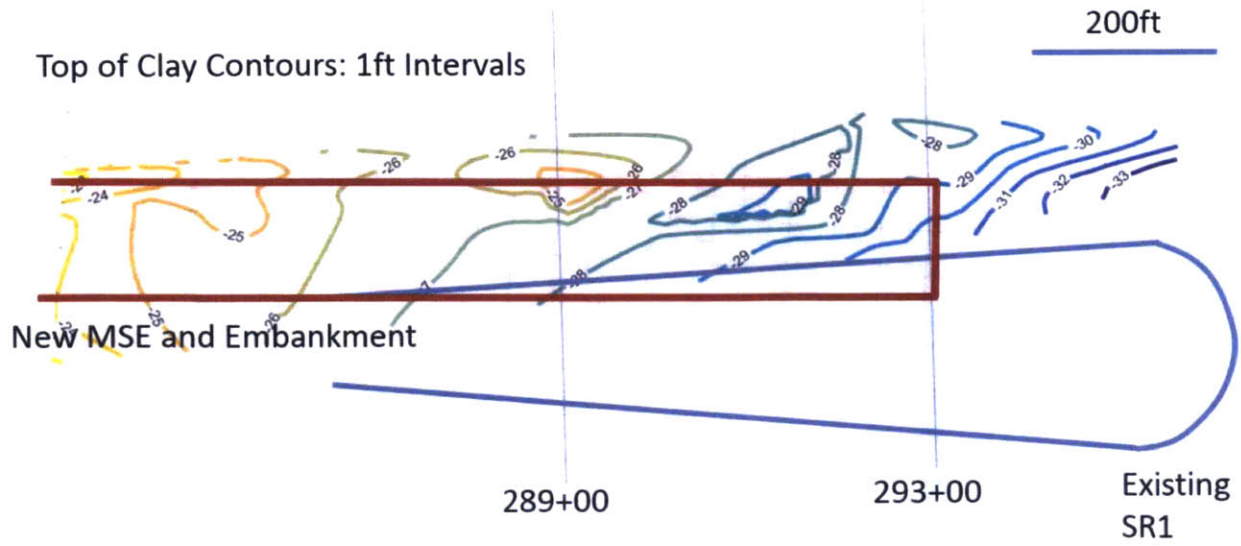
Top of clay contours at South bank prior to new bridge construction
